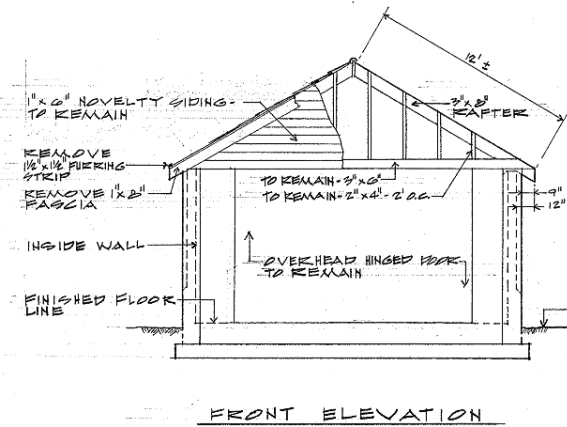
Close-up of front elevation from Boat House "Existing Roof Plan & Elevations."
